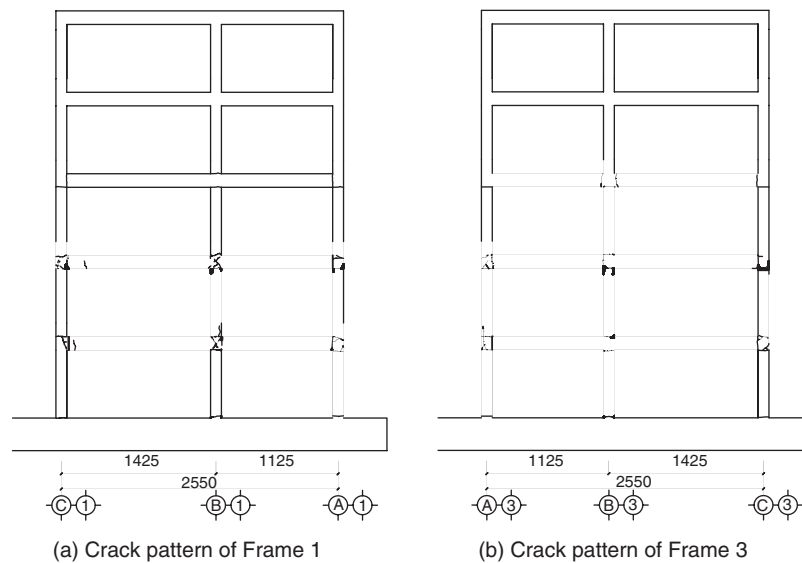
Typical crack pattern of the precast RAC frame
